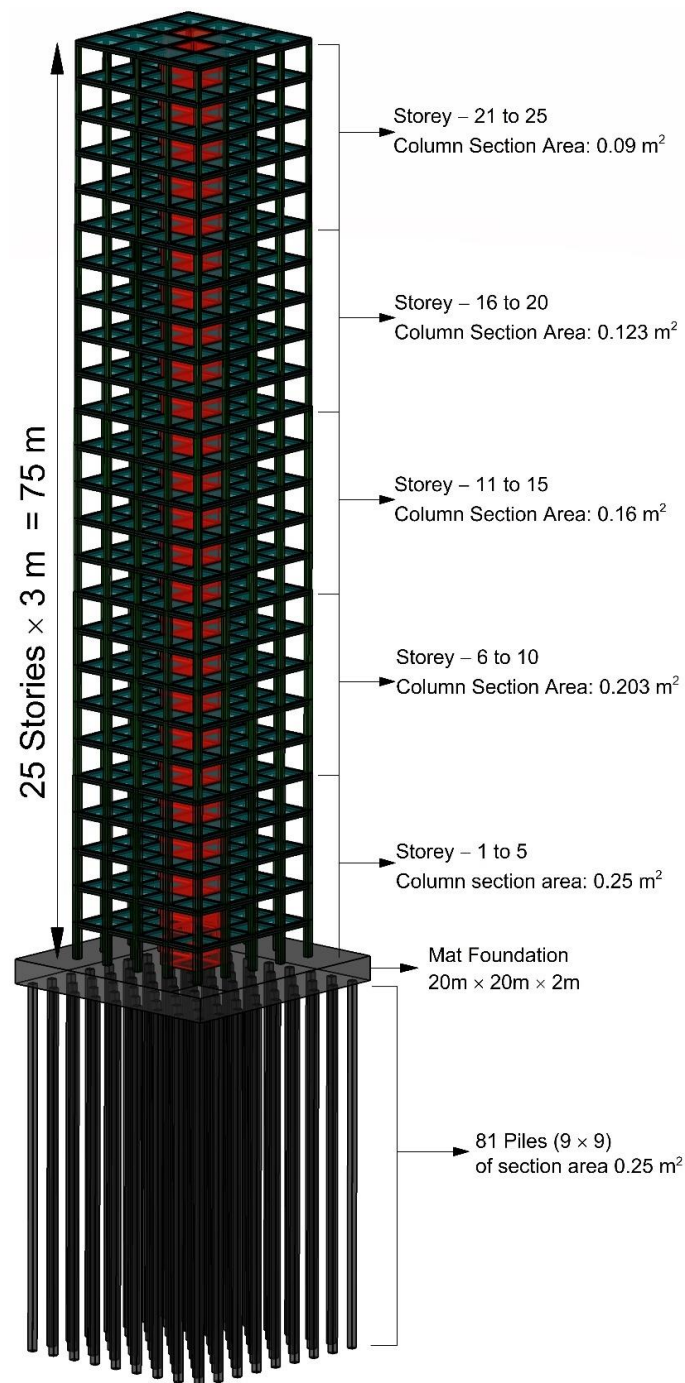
Details of the designed structural sections of the 25-story building used for the analysis.
